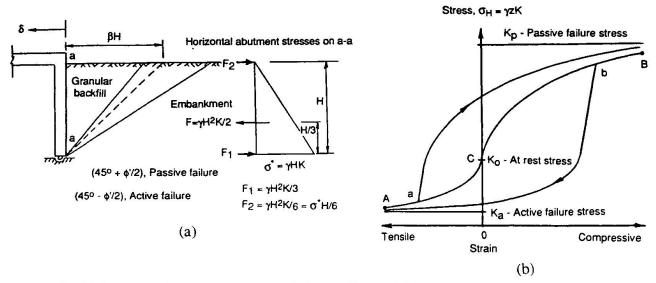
(a) Lateral soil pressure on a retaining wall type bridge abutment
